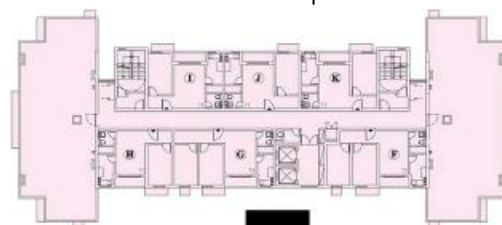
Floor Plan, Floor 24-25, Block 2, EDF. de Alameda da Tranquilidade
